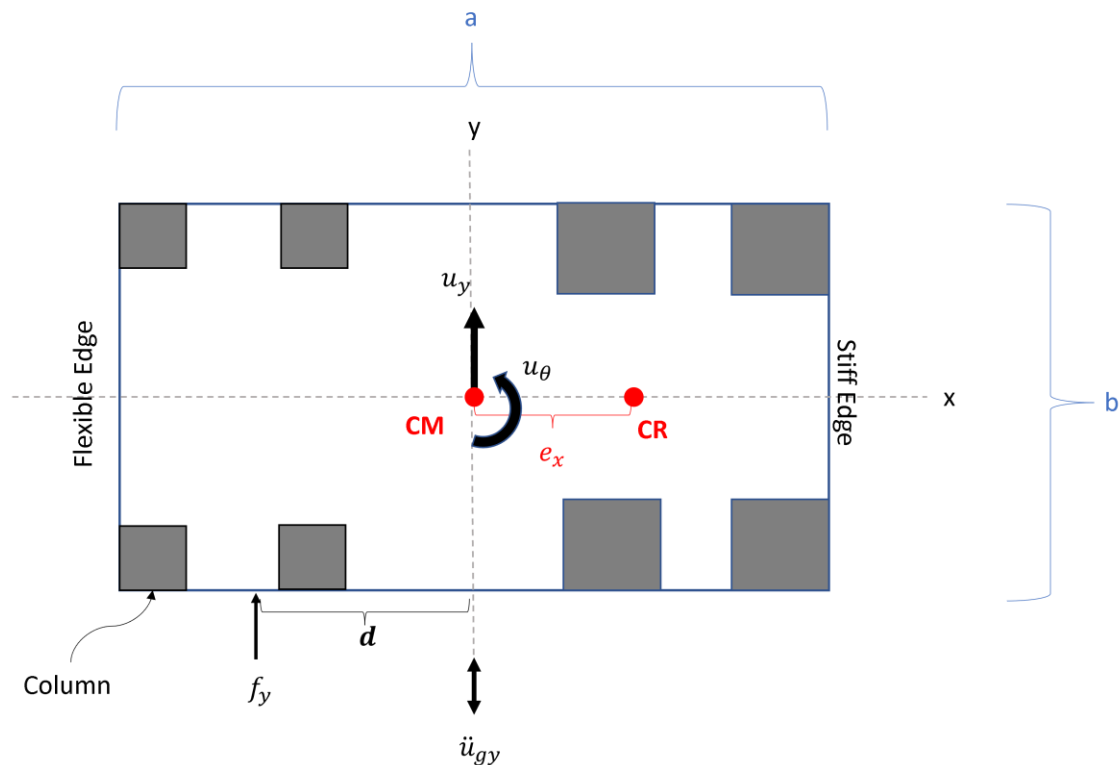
Floor plan of building model subject to ground acceleration \ddot{u}_{gy}
